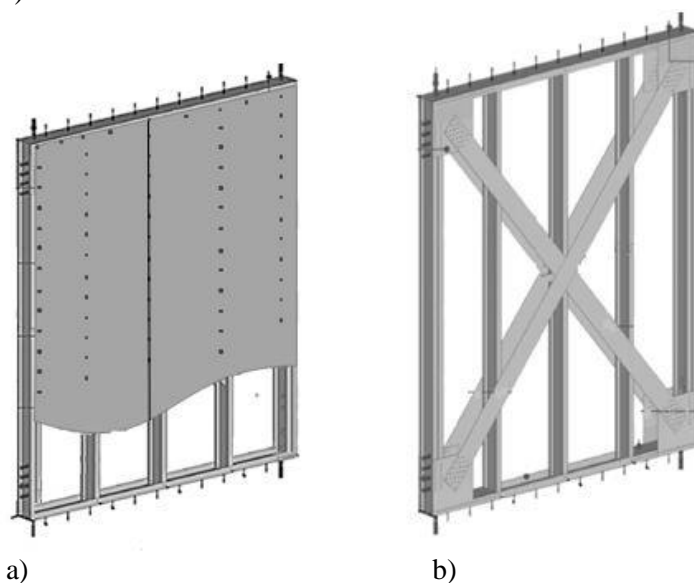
a) CFS gypsum-sheathed shear wall b) CFS strap-braced wall.
